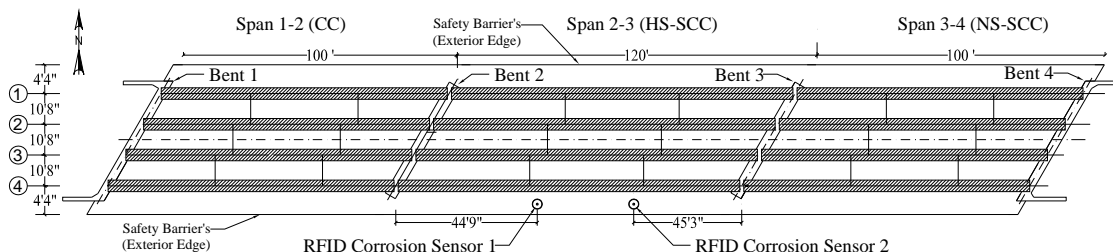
Bridge A7957 RFID Corrosion Sensors Installation (Plan View)
